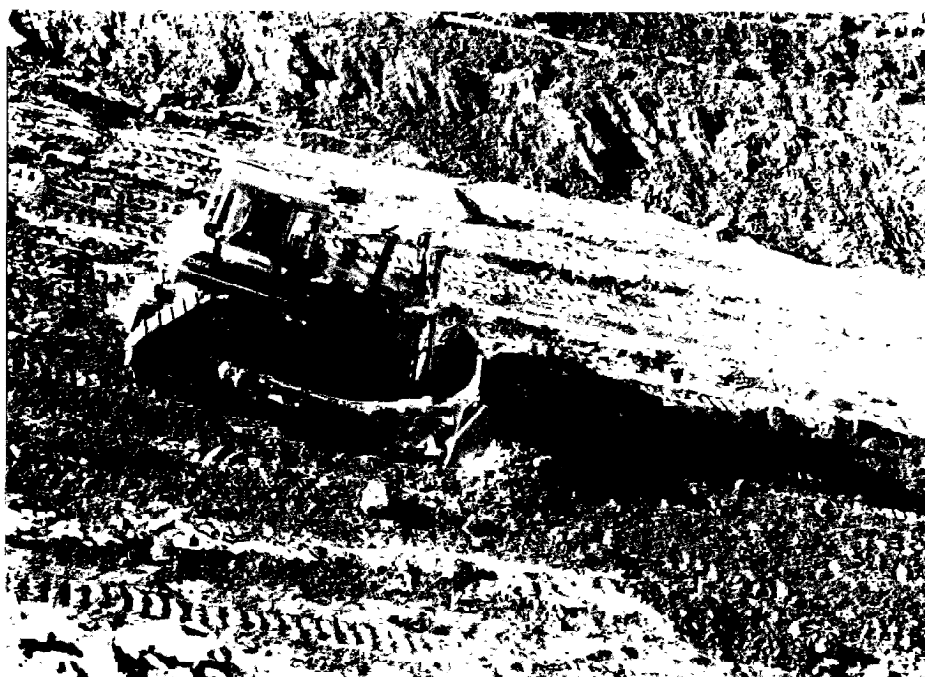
D-8 dozer pushing boulders down north face of Jackpile JP-W0-11.
